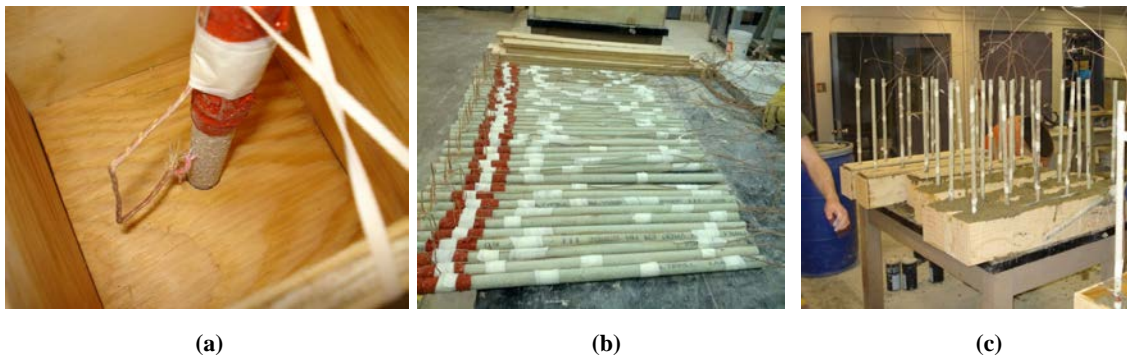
Construction of specimens: (a) Placement of thermocouples (b) Bond breaker (c) Concrete casting
